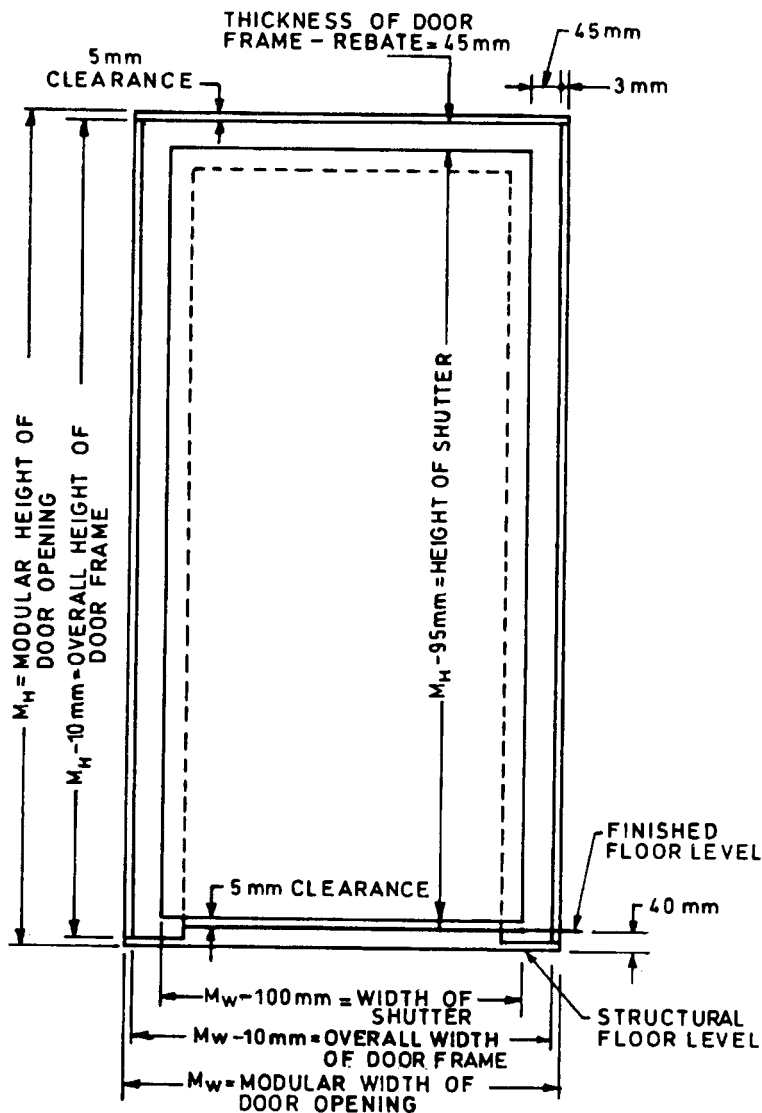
SKETCH ILLUSTRATING DIMENSIONS OF SHUTTER
